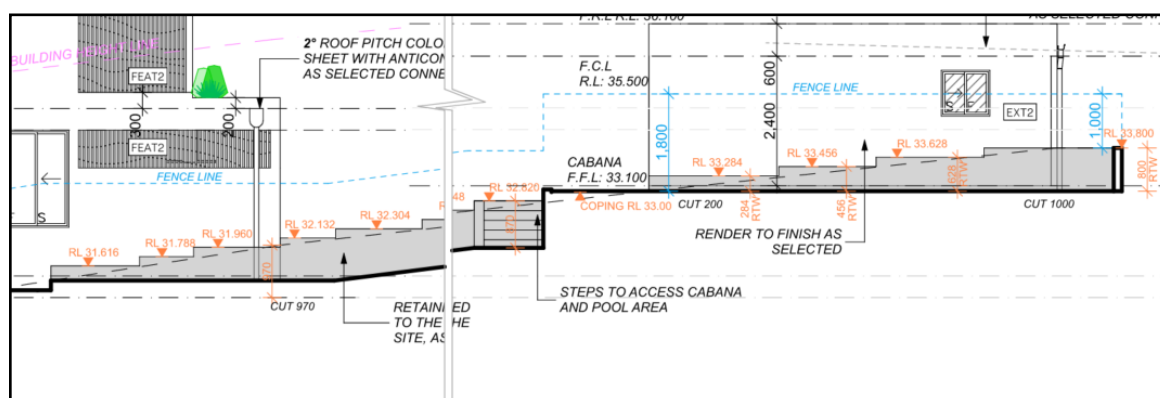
Eastern Elevation - 54 Daunt Avenue - Demonstrating the retaining walls required
